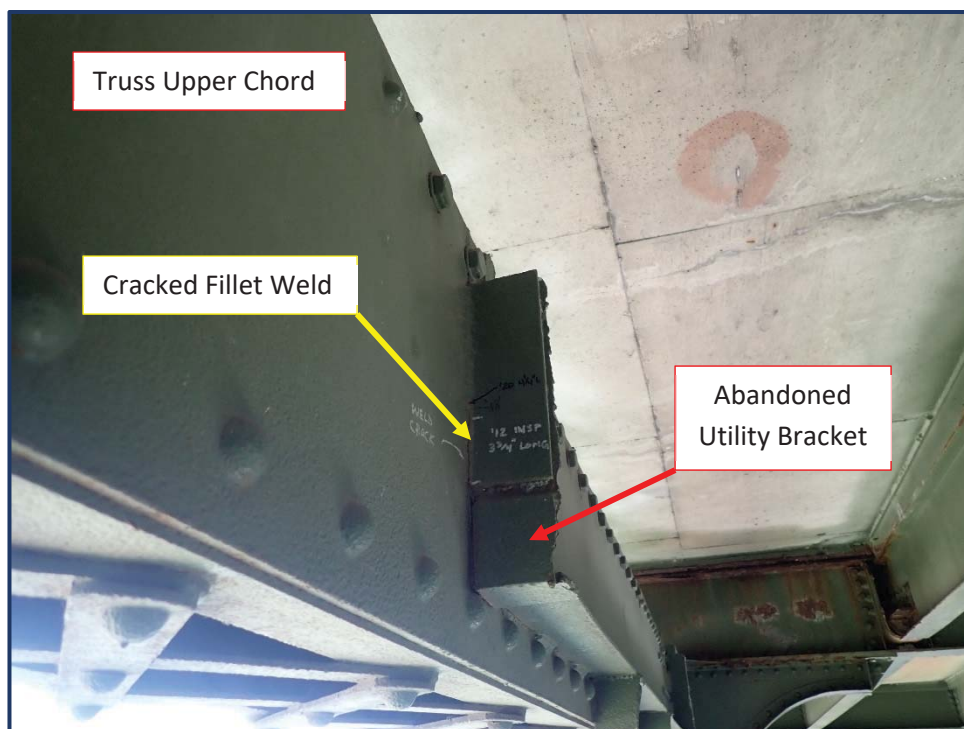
Abandoned Utility Bracket on Truss Upper Chord
